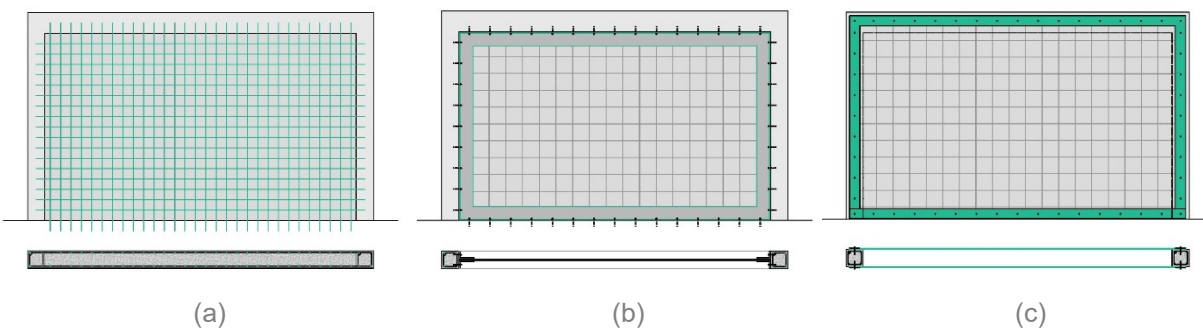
Some configurations of shear walls using reinforced concrete (a) and different steel elements (b) and (c).
